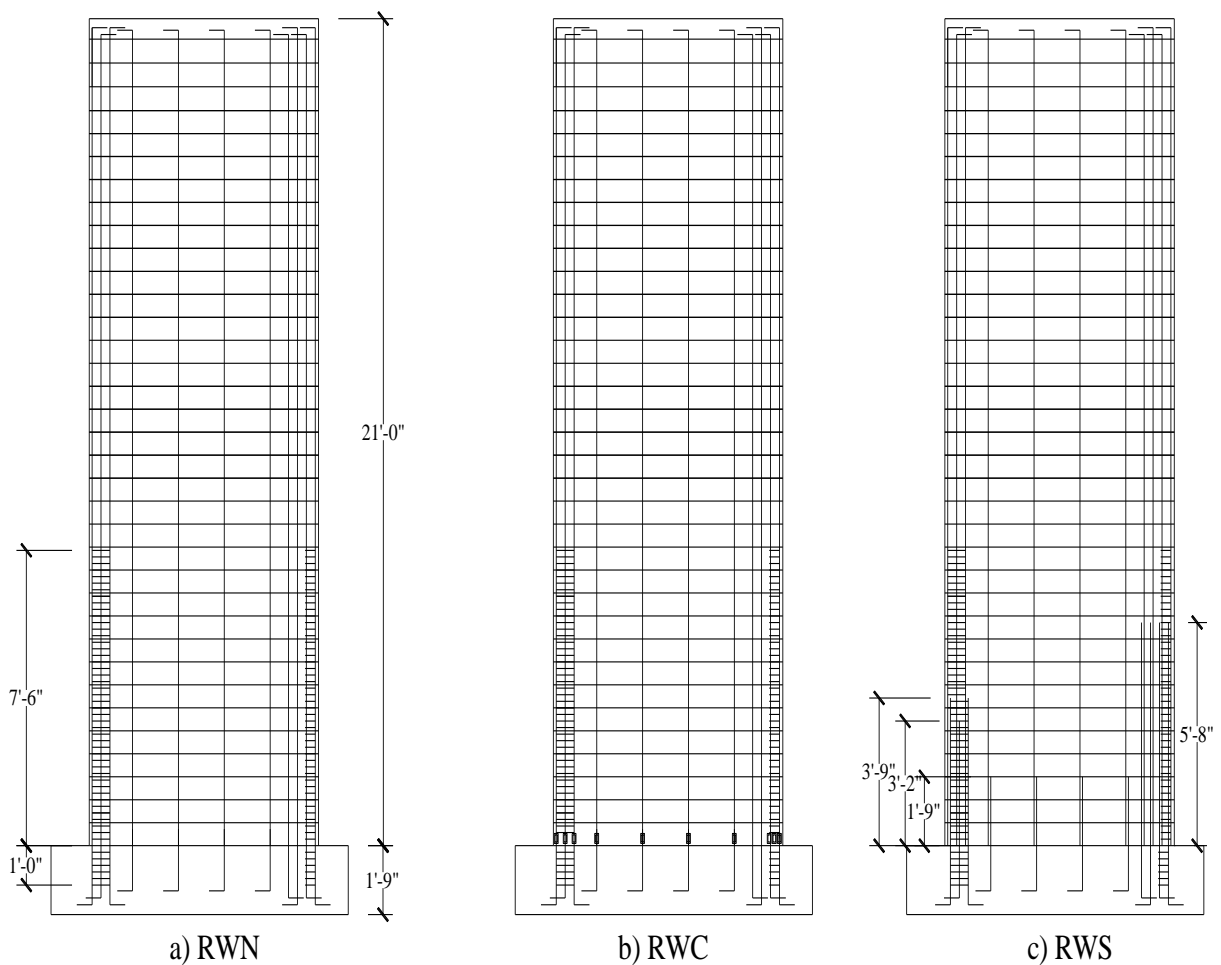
Reinforcement details along the wall height in the rectangular walls.
